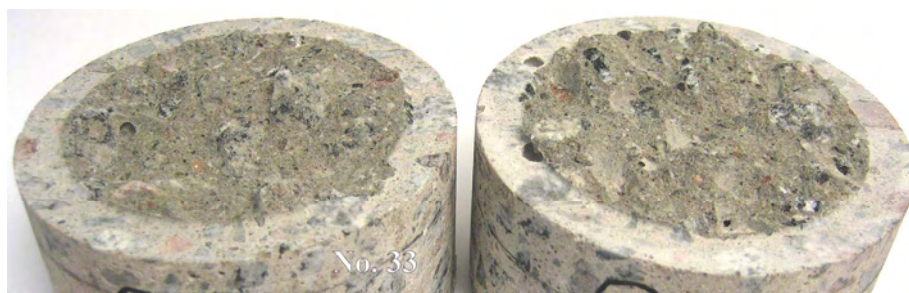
Photograph showing the failure surface for test No. 33 after fatigue test.
